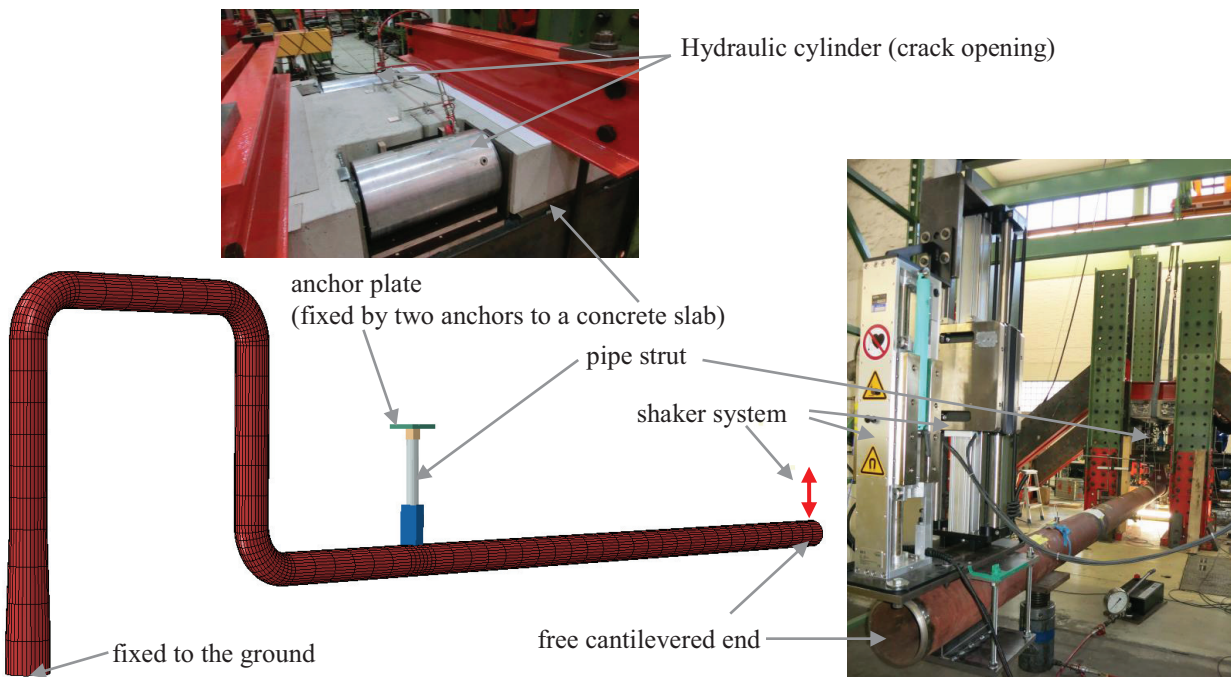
Mock-Up: Finite Element-Model (bottom left); Frontal view (bottom right); Concrete slab with additional hydraulic cylinders for defined crack opening (top).
